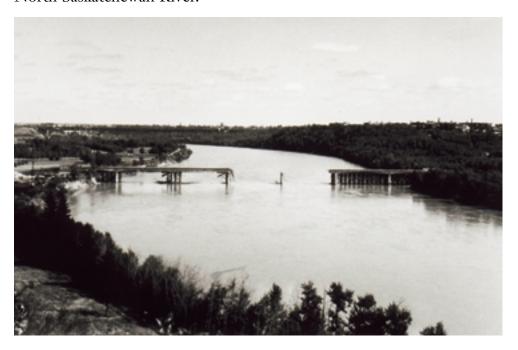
Edmonton's Groat Bridge was damaged by flood waters during construction.
